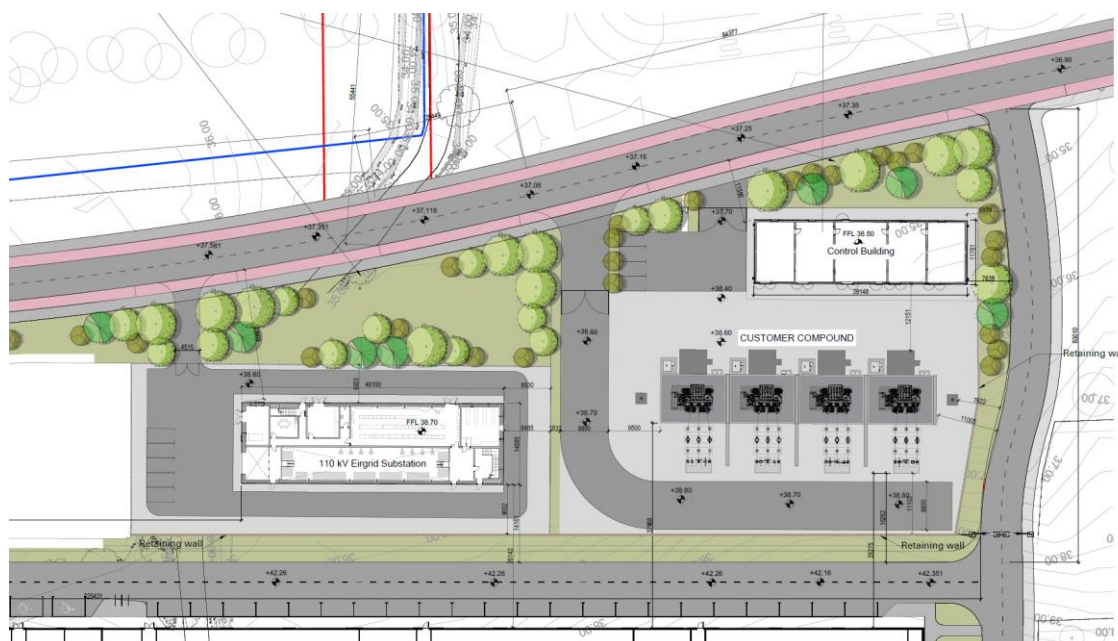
110 kV Substation Site Layout (Reddy Architects: DUB30-02-ZZZ-L00-DR-RAU-AR-1004)
